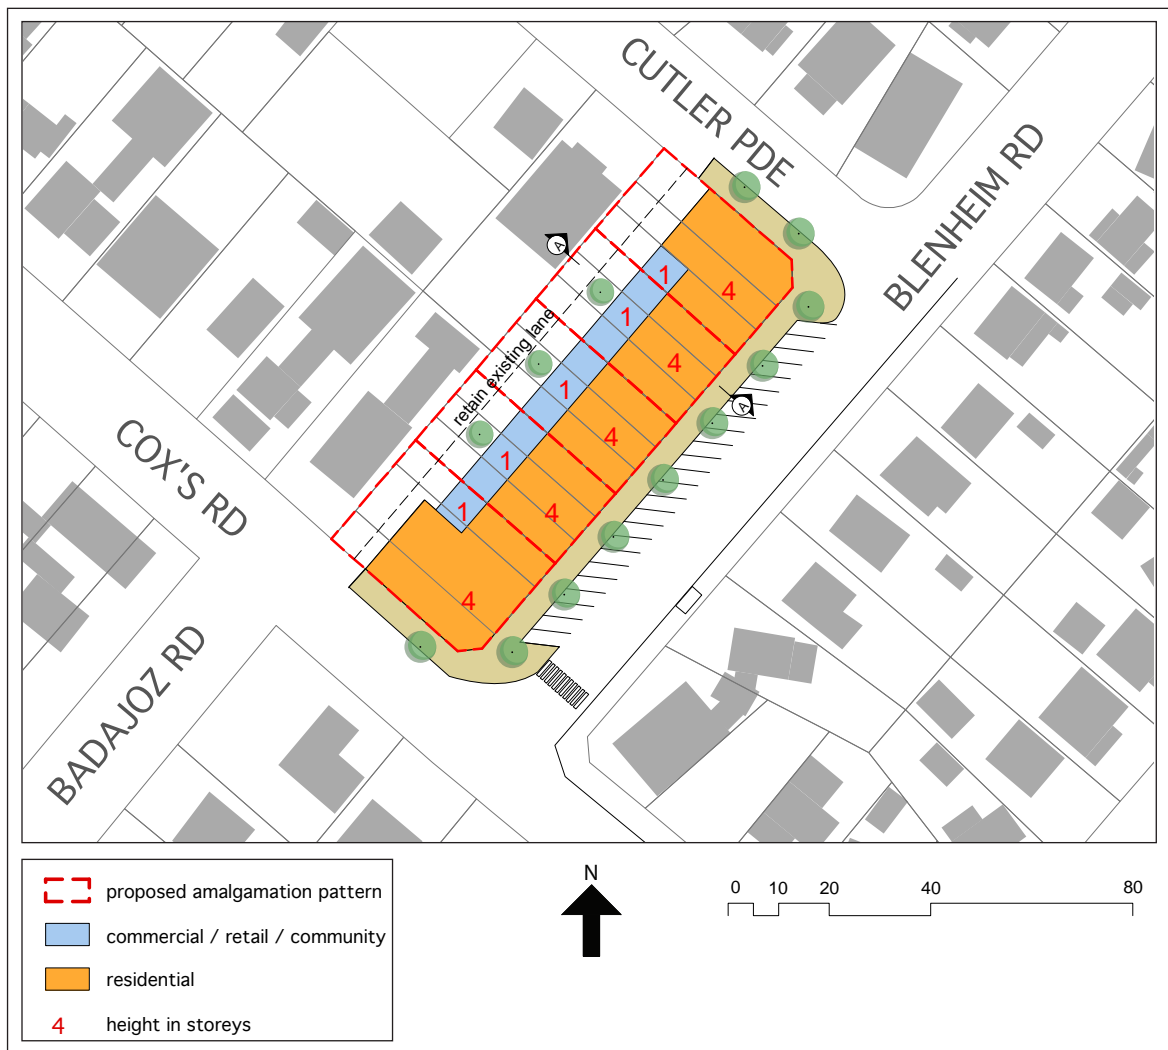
Blenheim Road Small Centre Building Height Control
